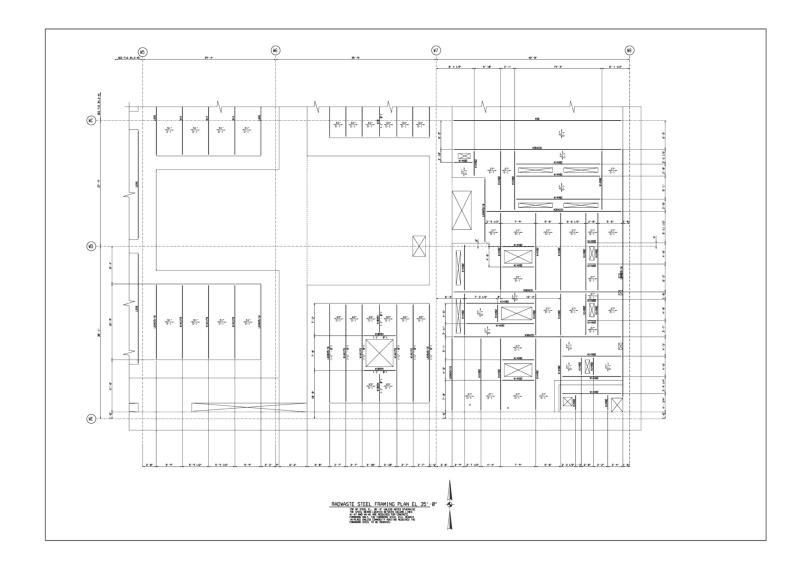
H.3-46 El 35'-0" Steel Layout Between Column Lines W5-W8 and WC-WE
